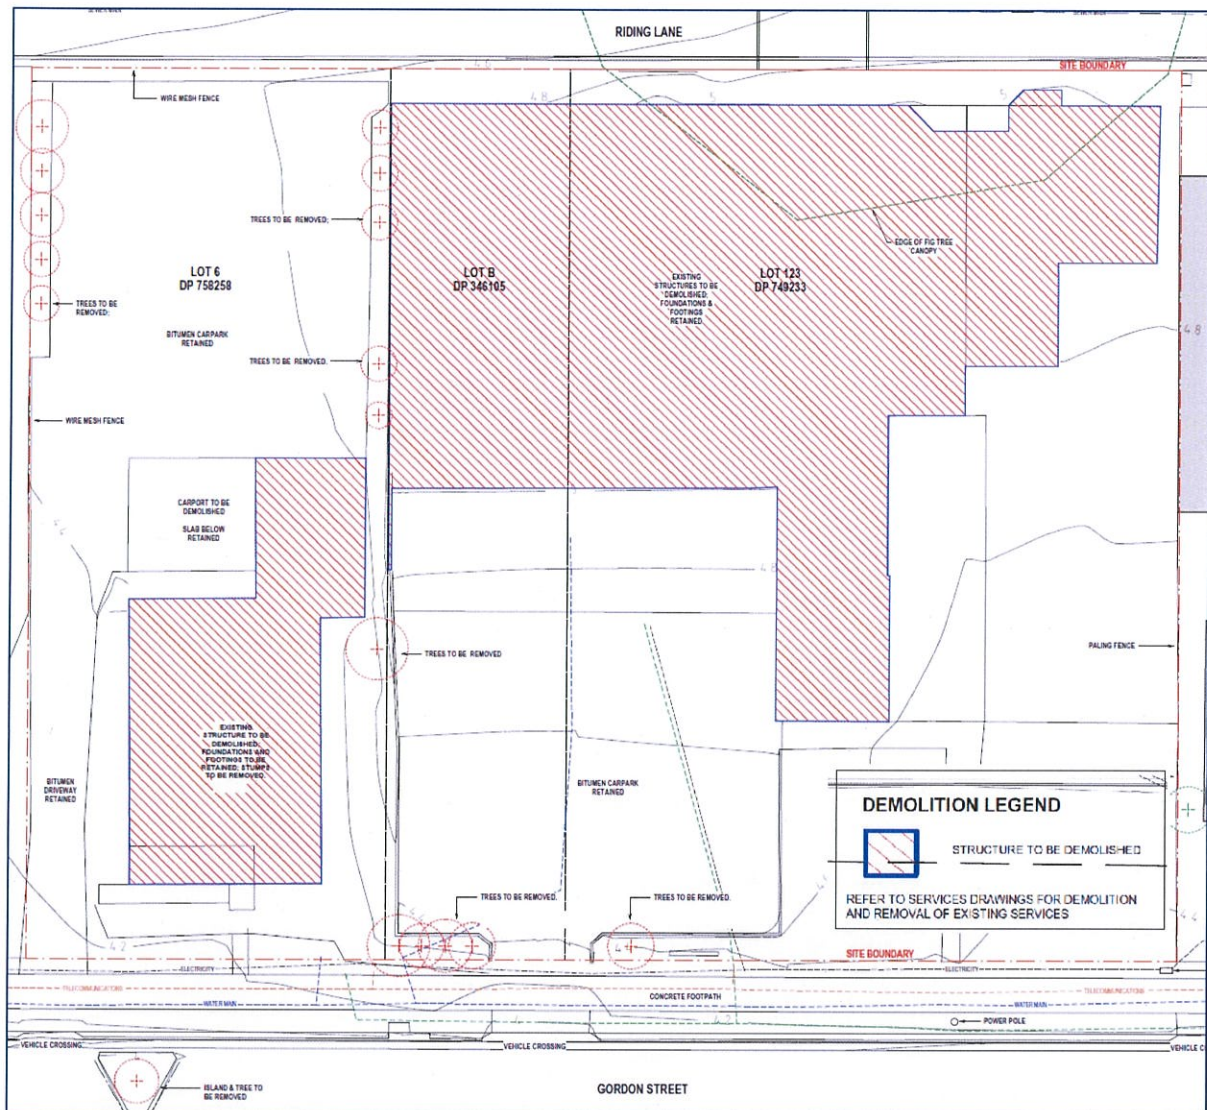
| Extract of approved demolition plan (source: DA No. 0199/20)
